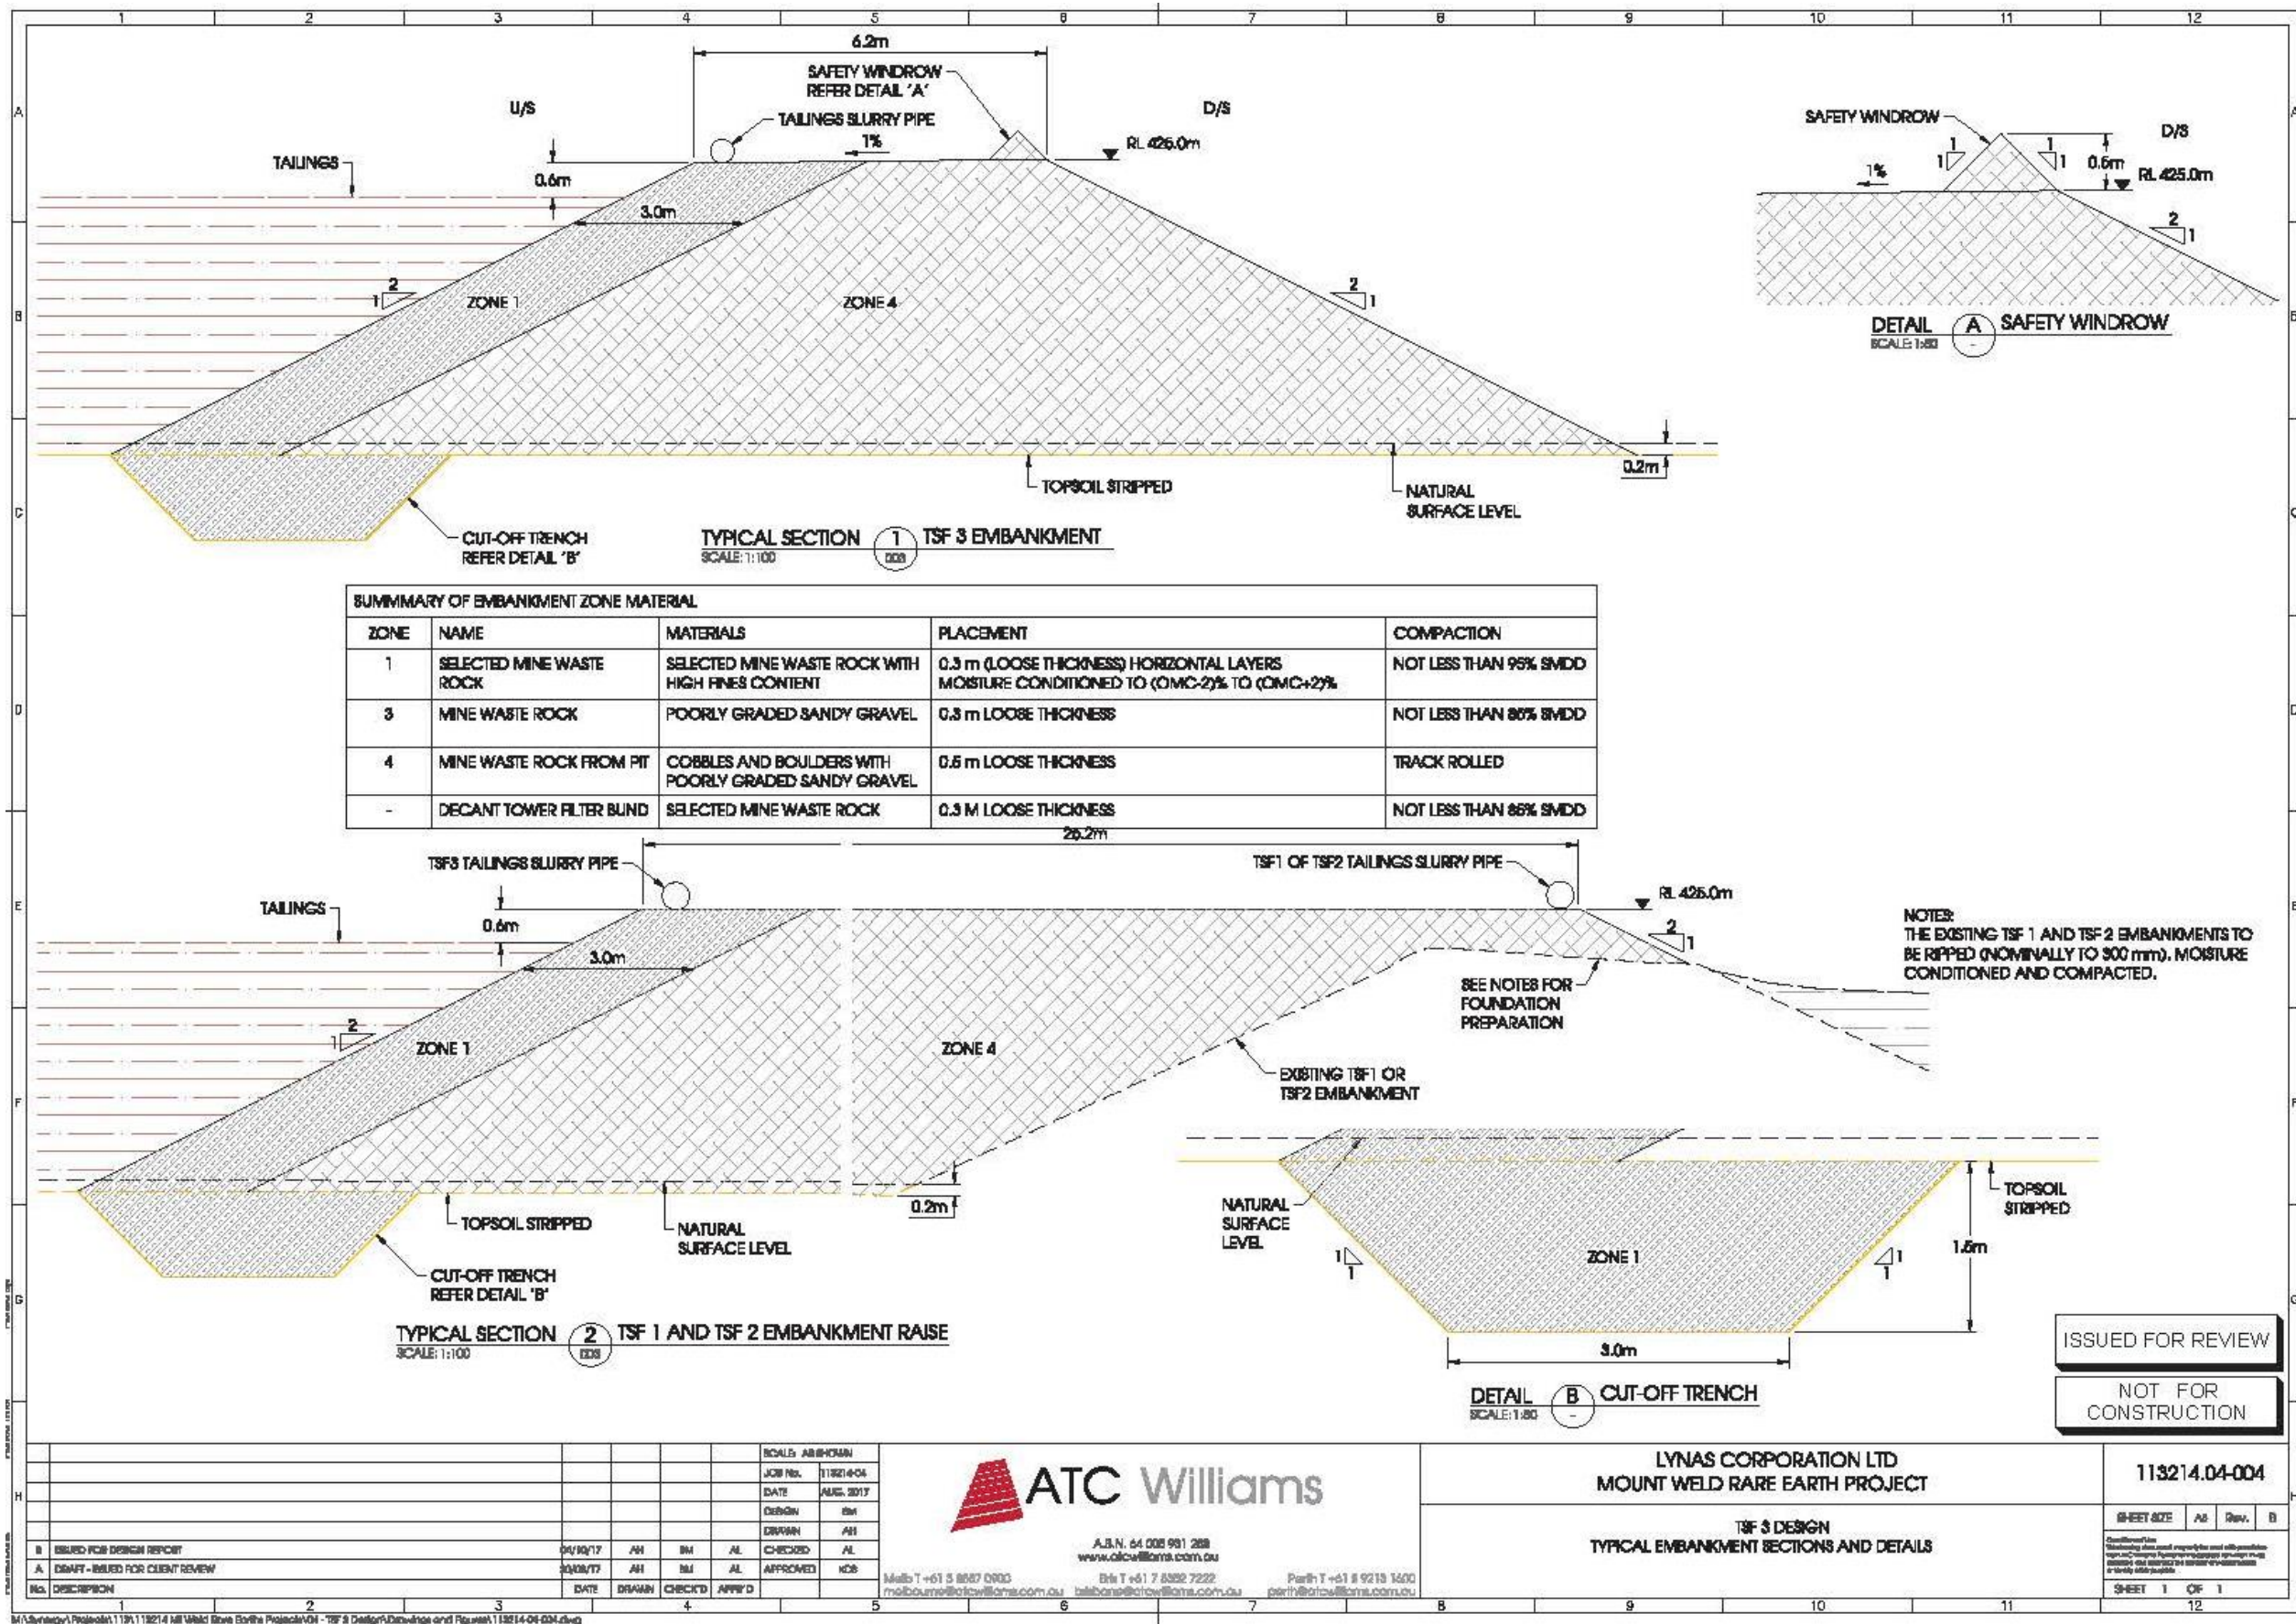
Tailings Storage Facility 3 Embankment Design
